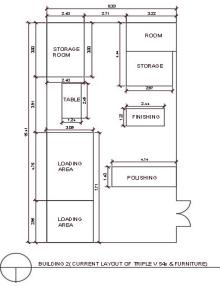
Building 2 (Current Layout of Triple V S4s & Furniture)
